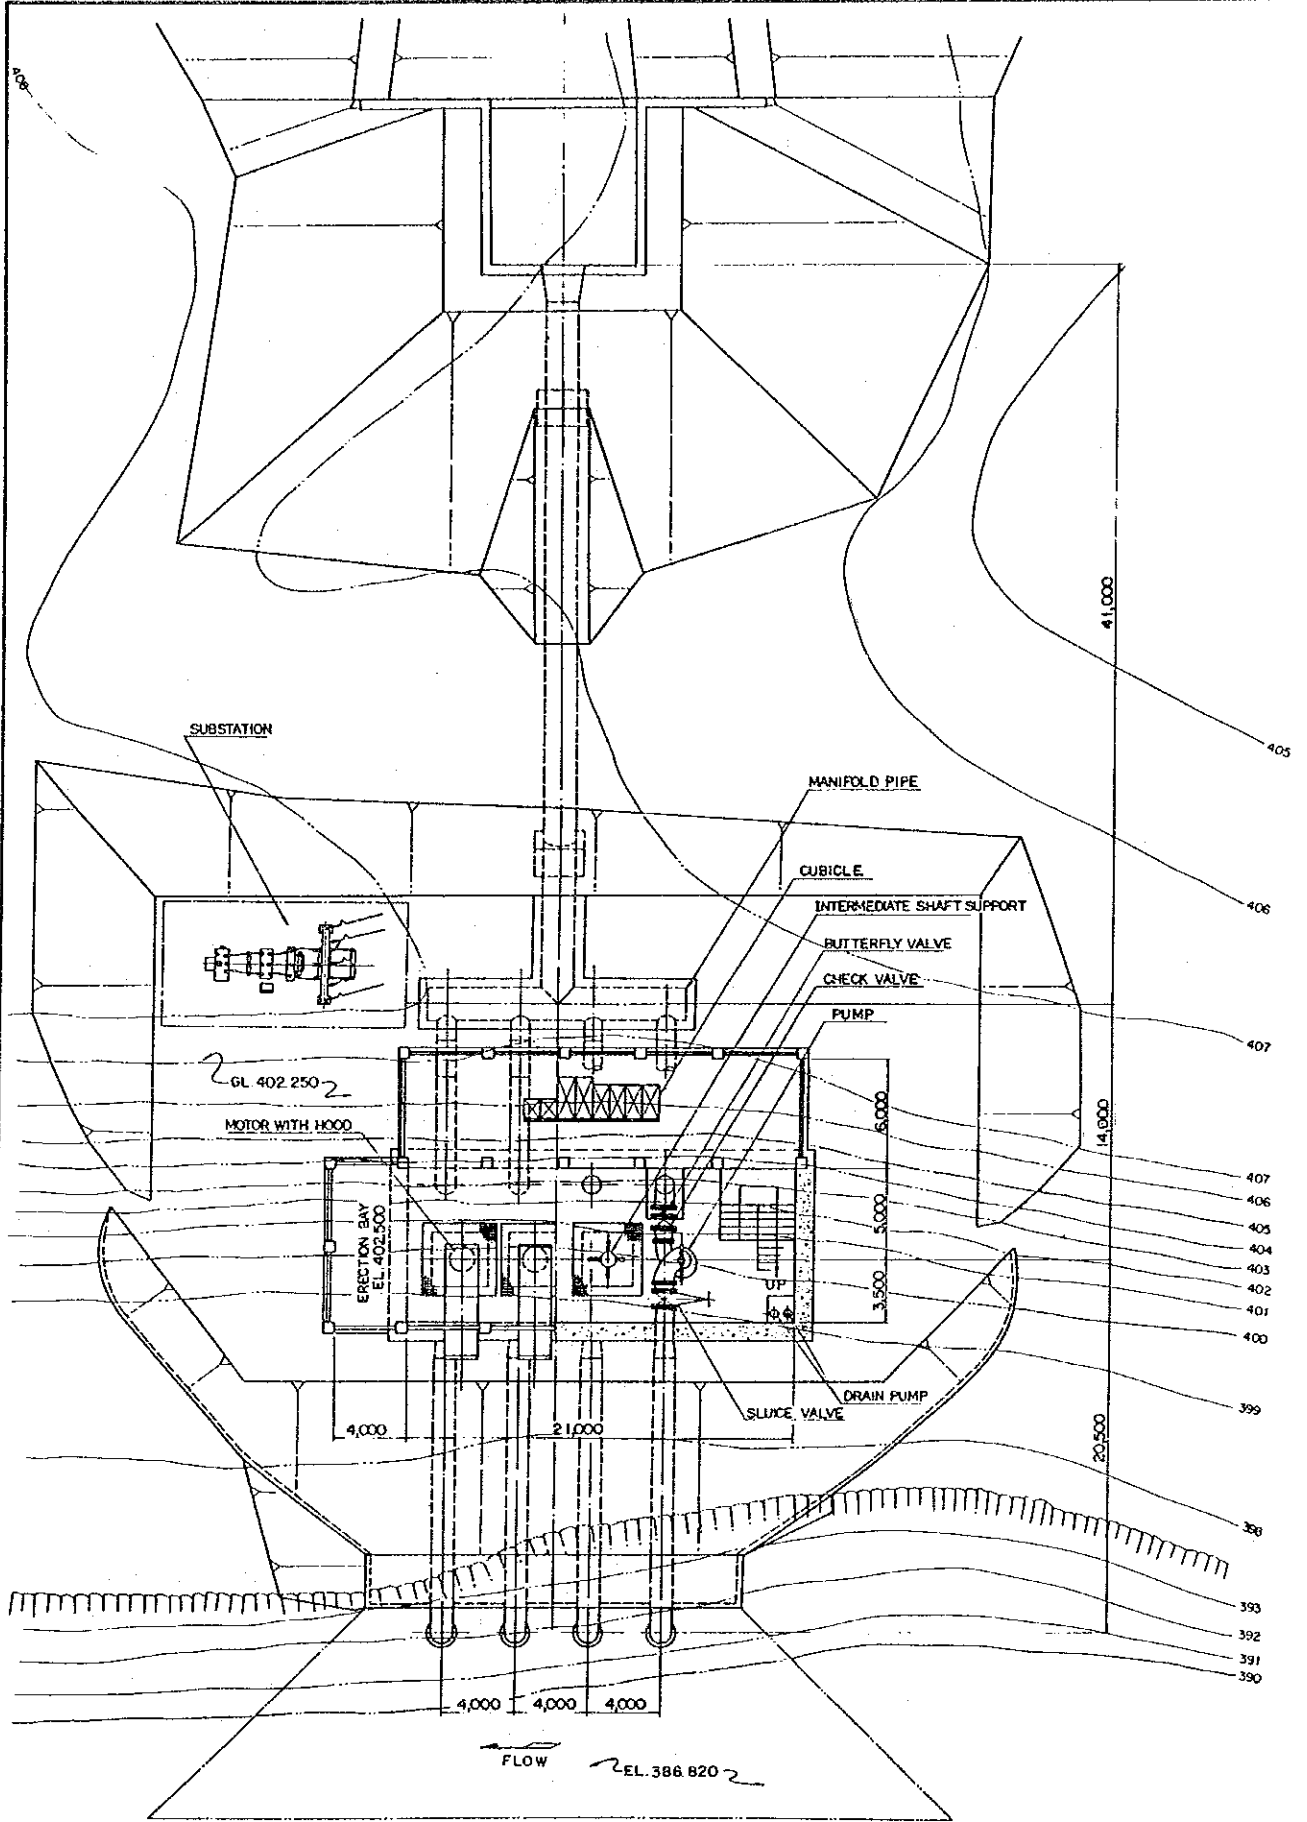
(1/2) GENERAL LAYOUT OF PROPOSED PUMPING STATION
